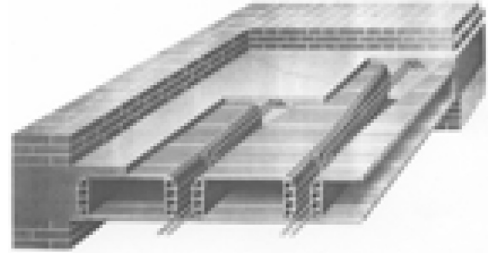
The concrete hollow bricks floor system, as described in an original brochure of the time of construction. It is worth to notice the widening of the concrete beams (“travetti”) in correspondence of the bearing edges.
